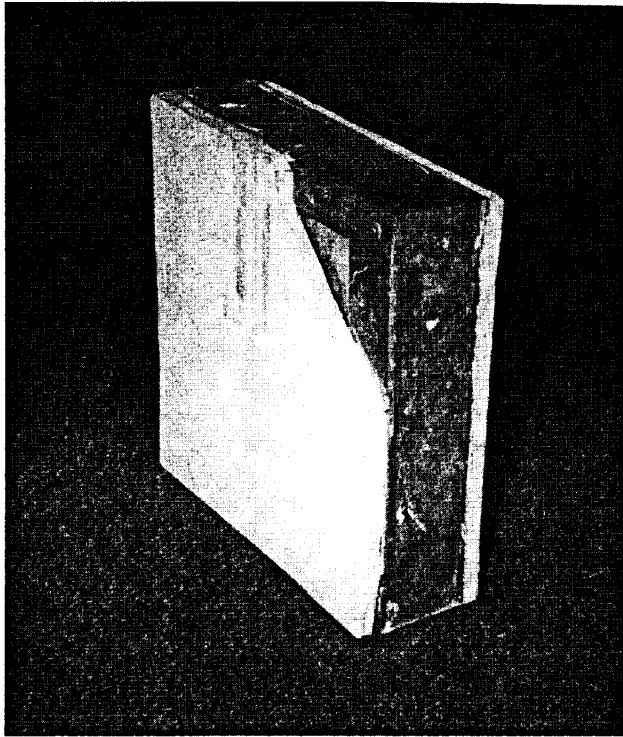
The outlook out of partion wall made of gypsum cardboard filled with phosphogypsum
